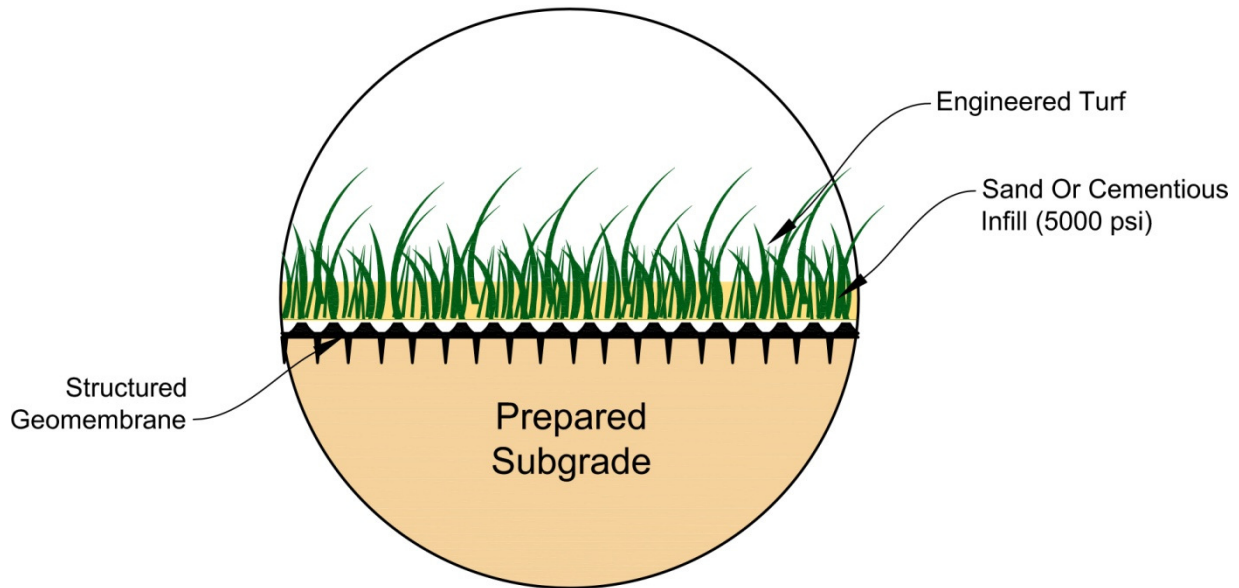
Section of Engineered Synthetic Turf (EST) System with Sand Infill OR Concrete-Enhanced Synthetic Turf (CEST) Revetment System with Cementitious Infill
